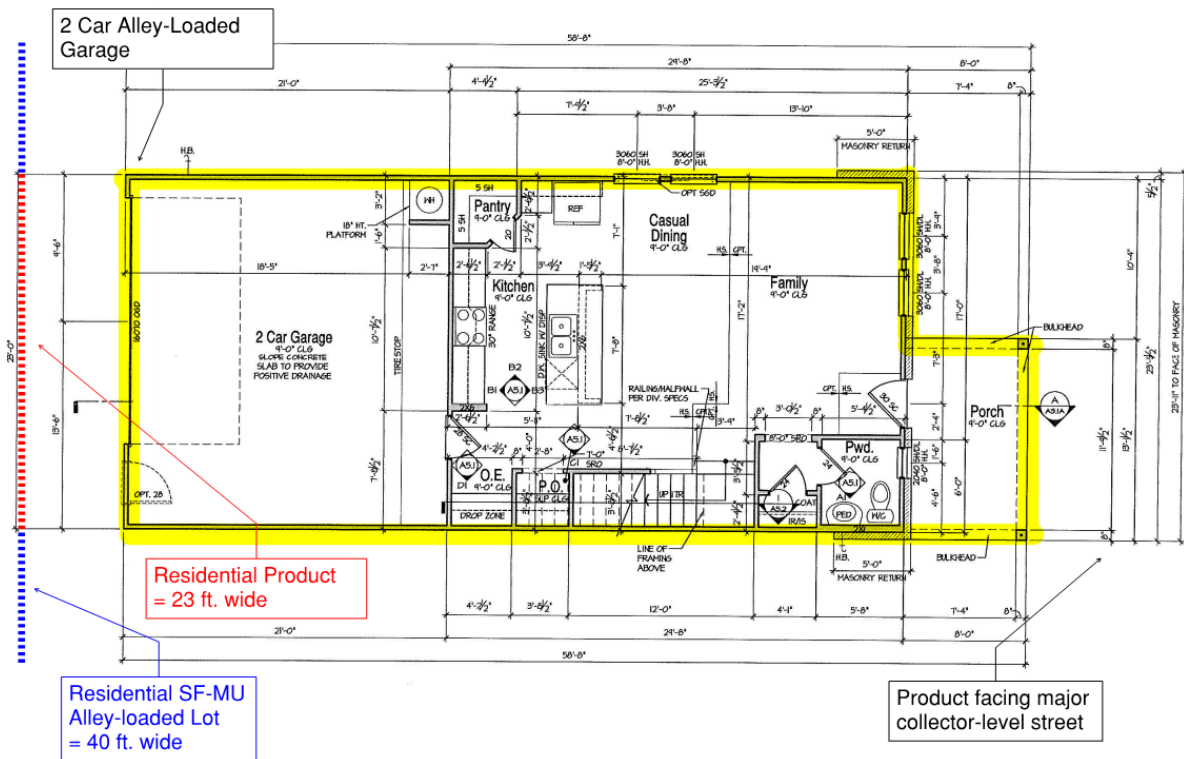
SF-MU Alley-Loaded, Attached Garage Example 2
